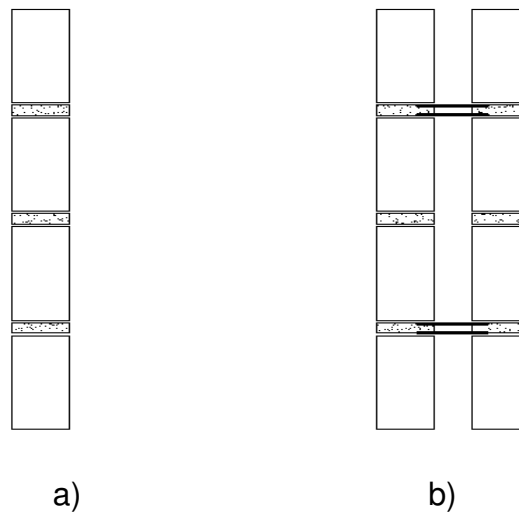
Types of masonry construction: a) Single leaf; b) Cavity.
